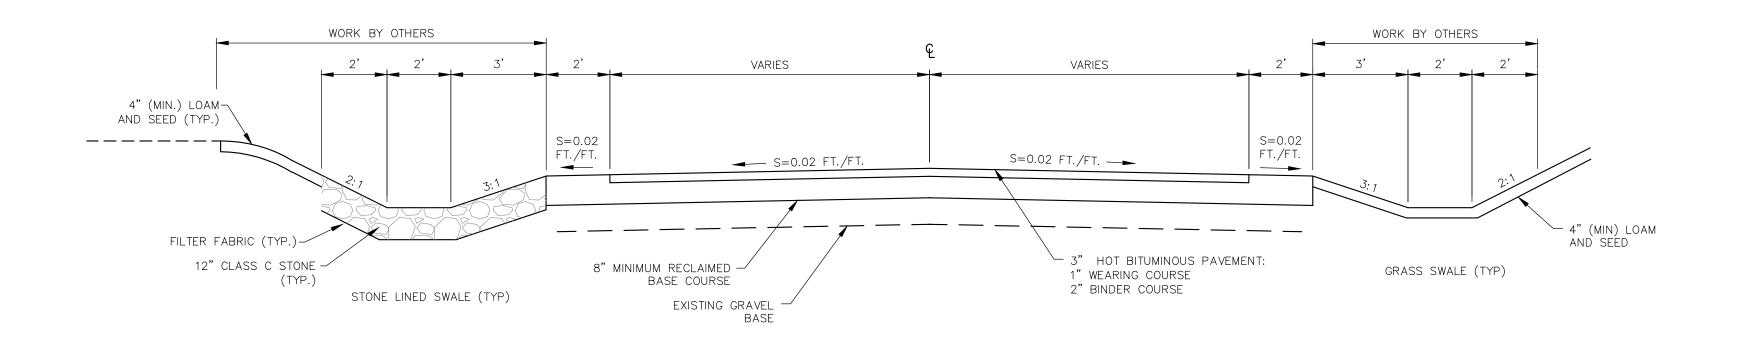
SITE PLAN SHAKER JERRY ROAD REHABILITATION
